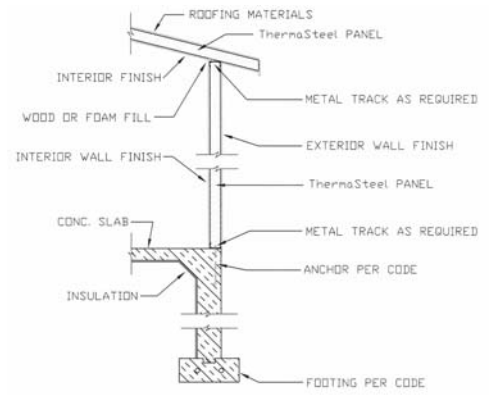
\*—TYPICAL INSTALLATION DETAILS
